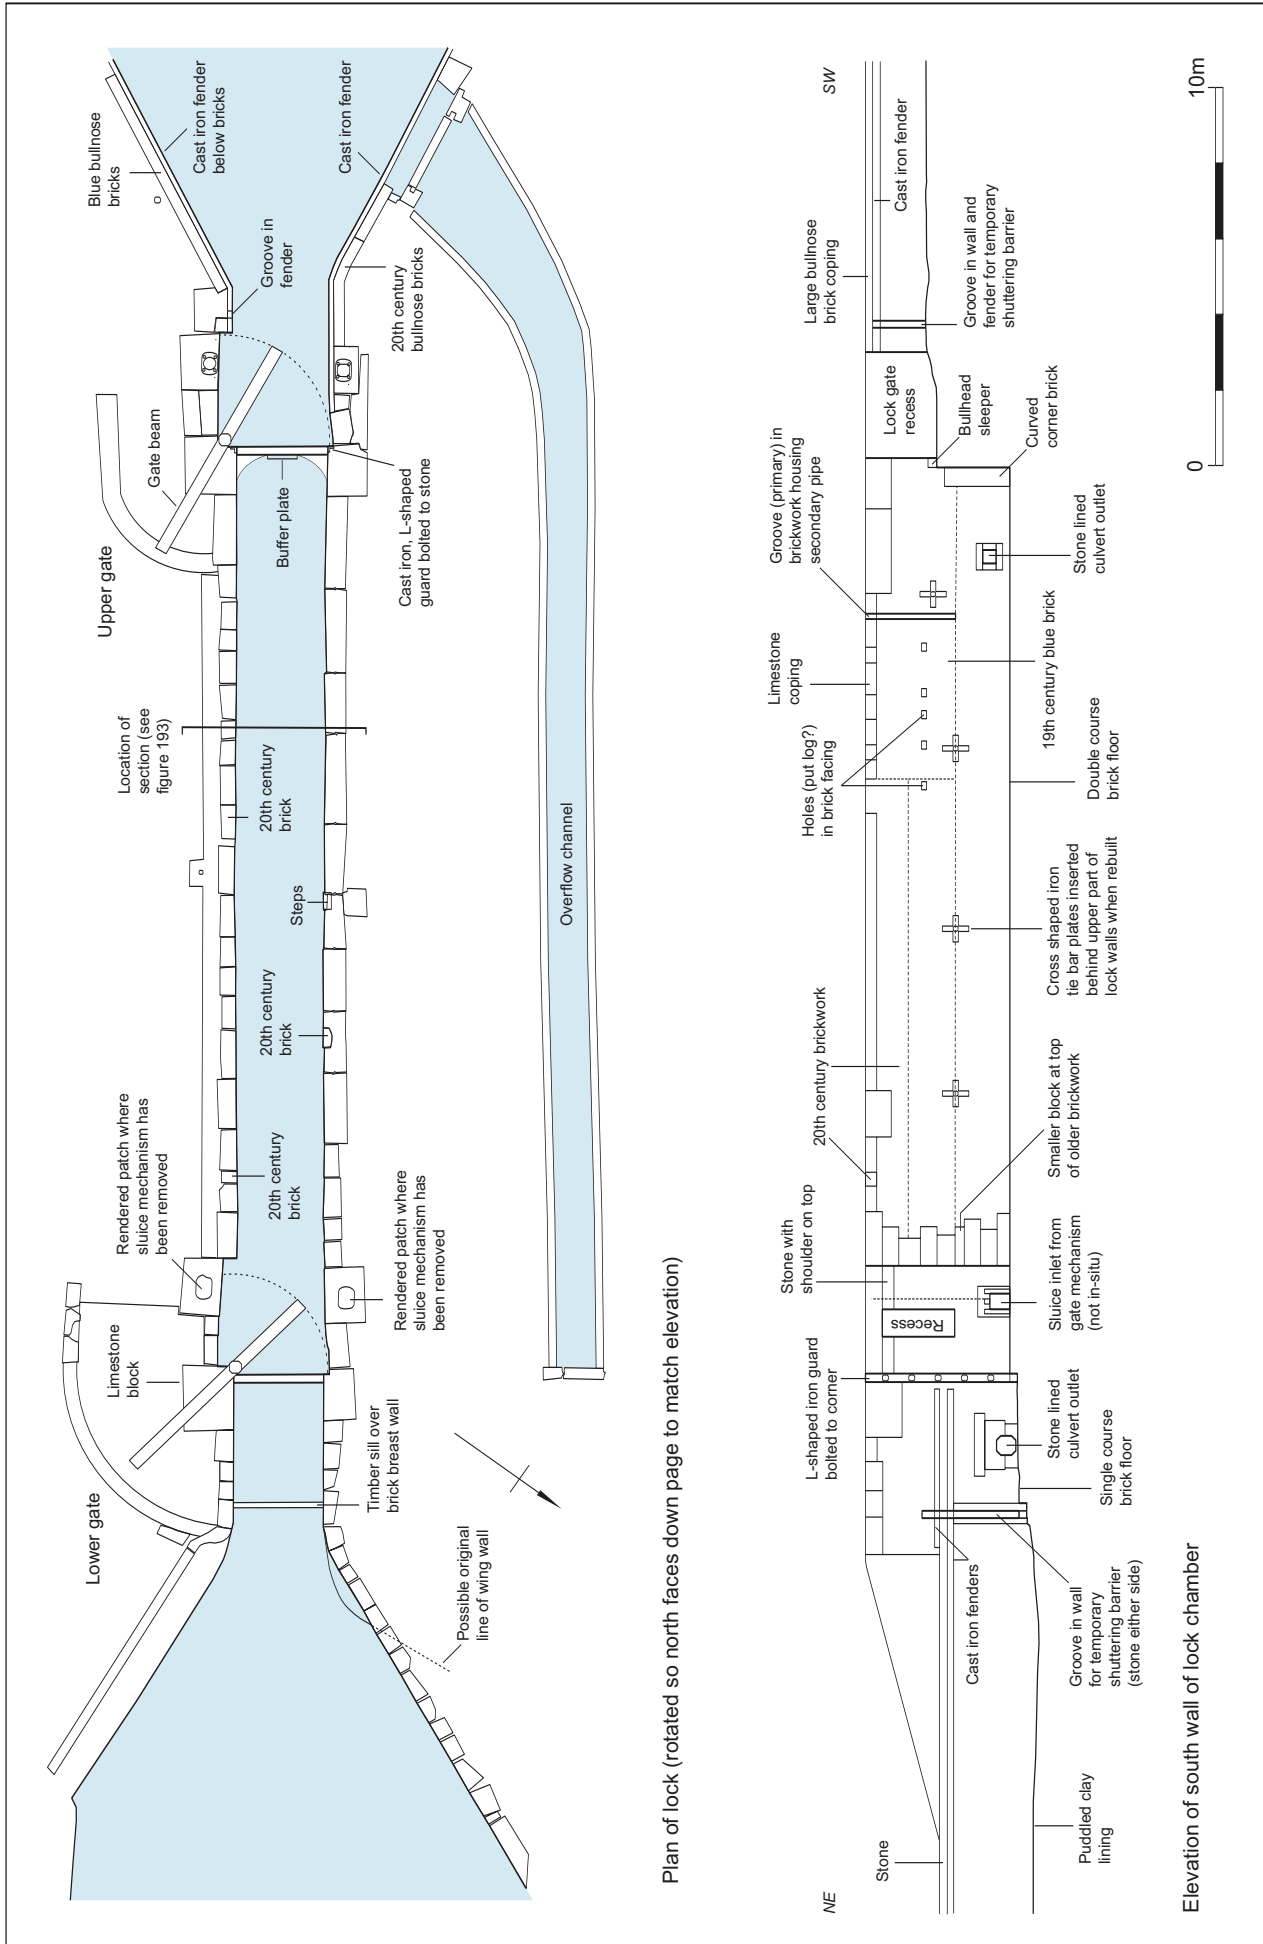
Plan of the lock and elevation of the south wall of the lock chamber
